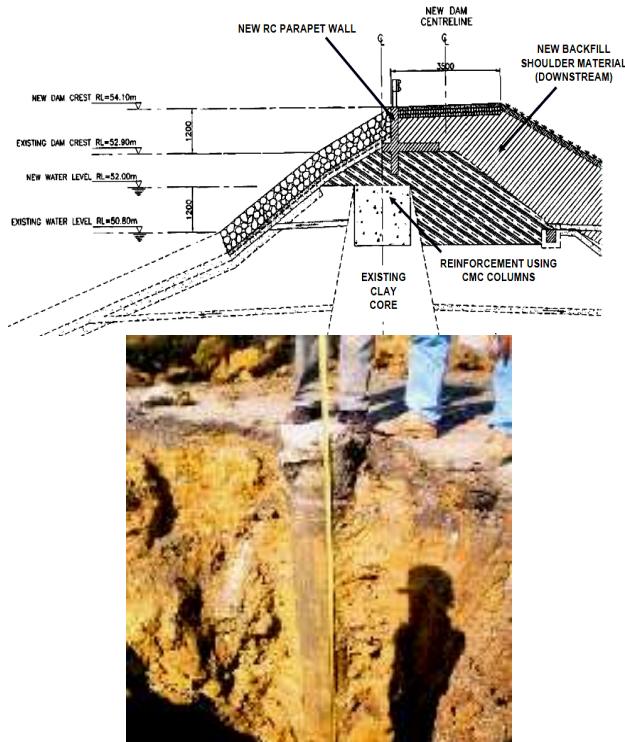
Cross-section of raised embankment (top) and trial column (bottom) at Sebubut Dam.
